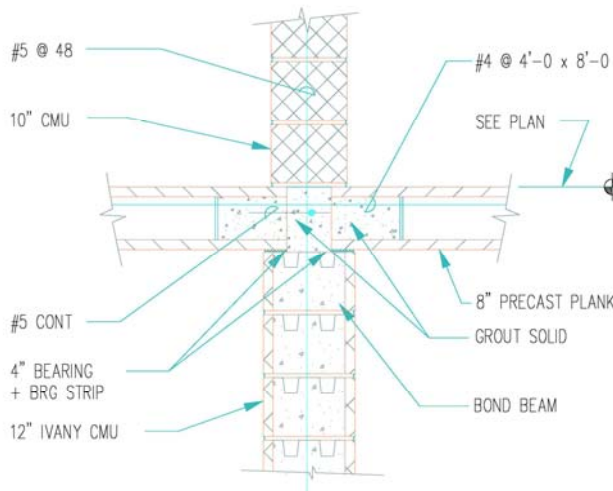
Section of 8” precast plank bearing on 10” CMU wall
